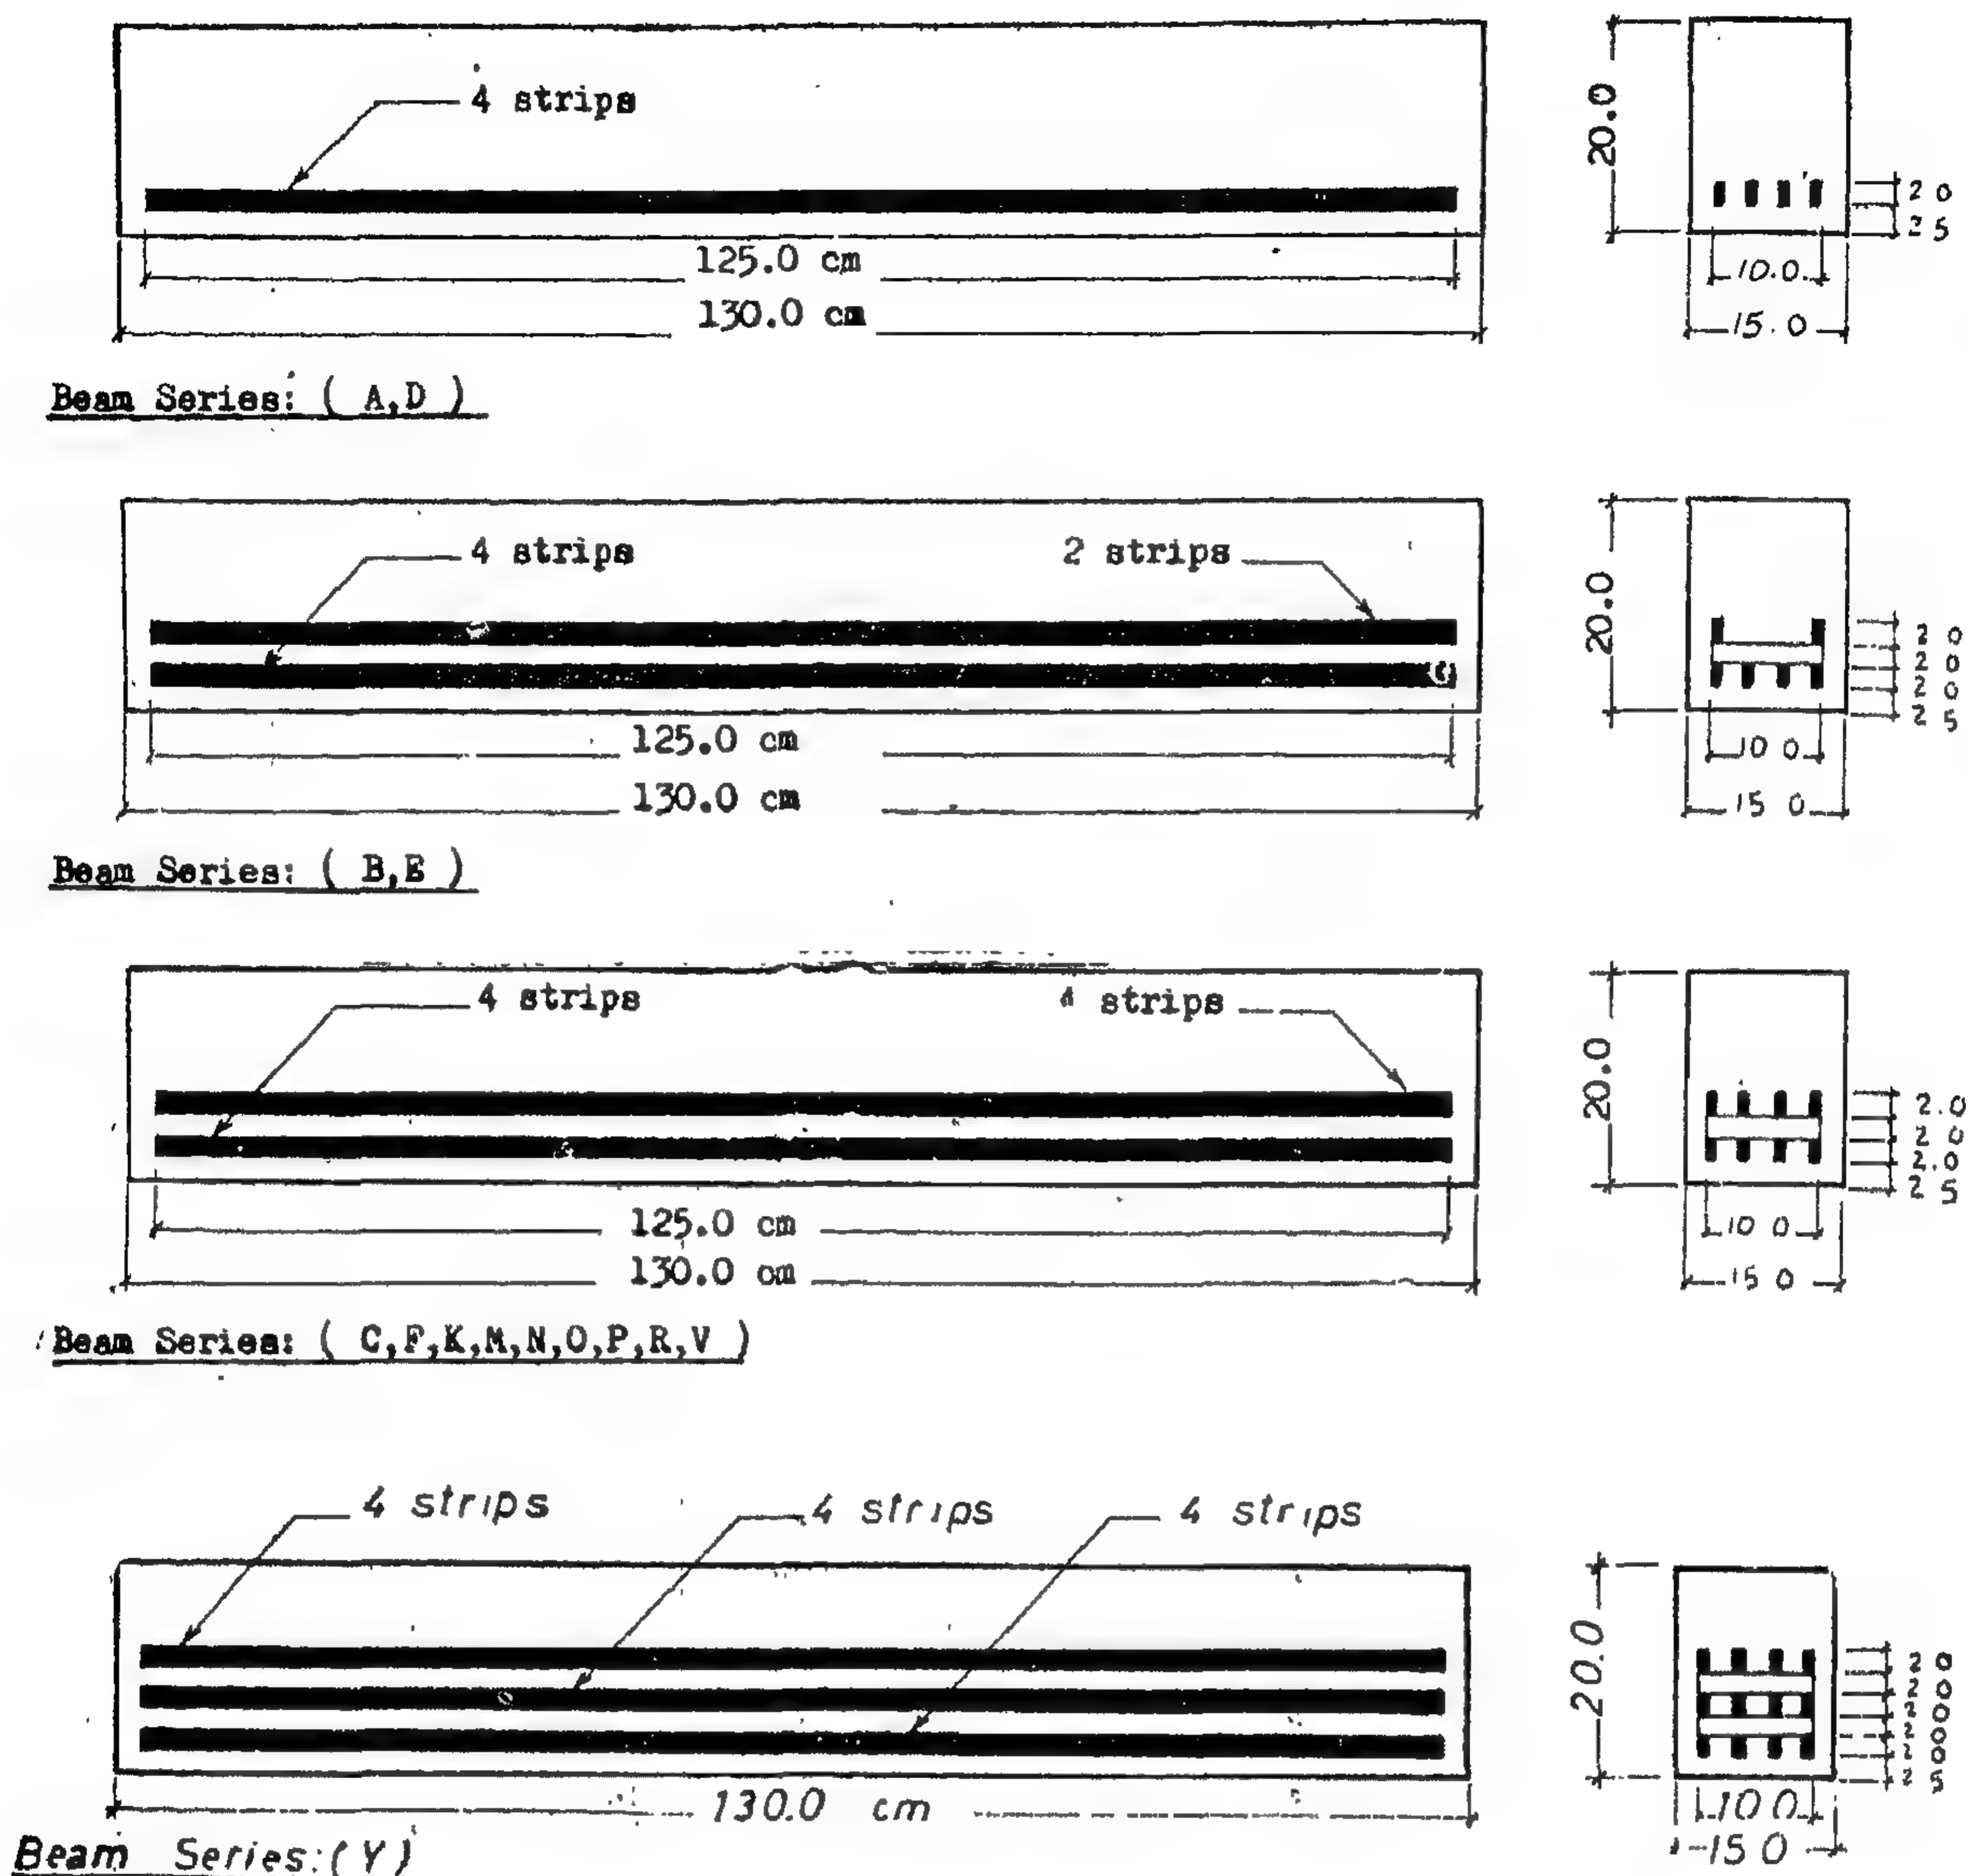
Rectangular Concrete Beams (15 × 20 × 130 cm) Reinforced with Bamboo.
